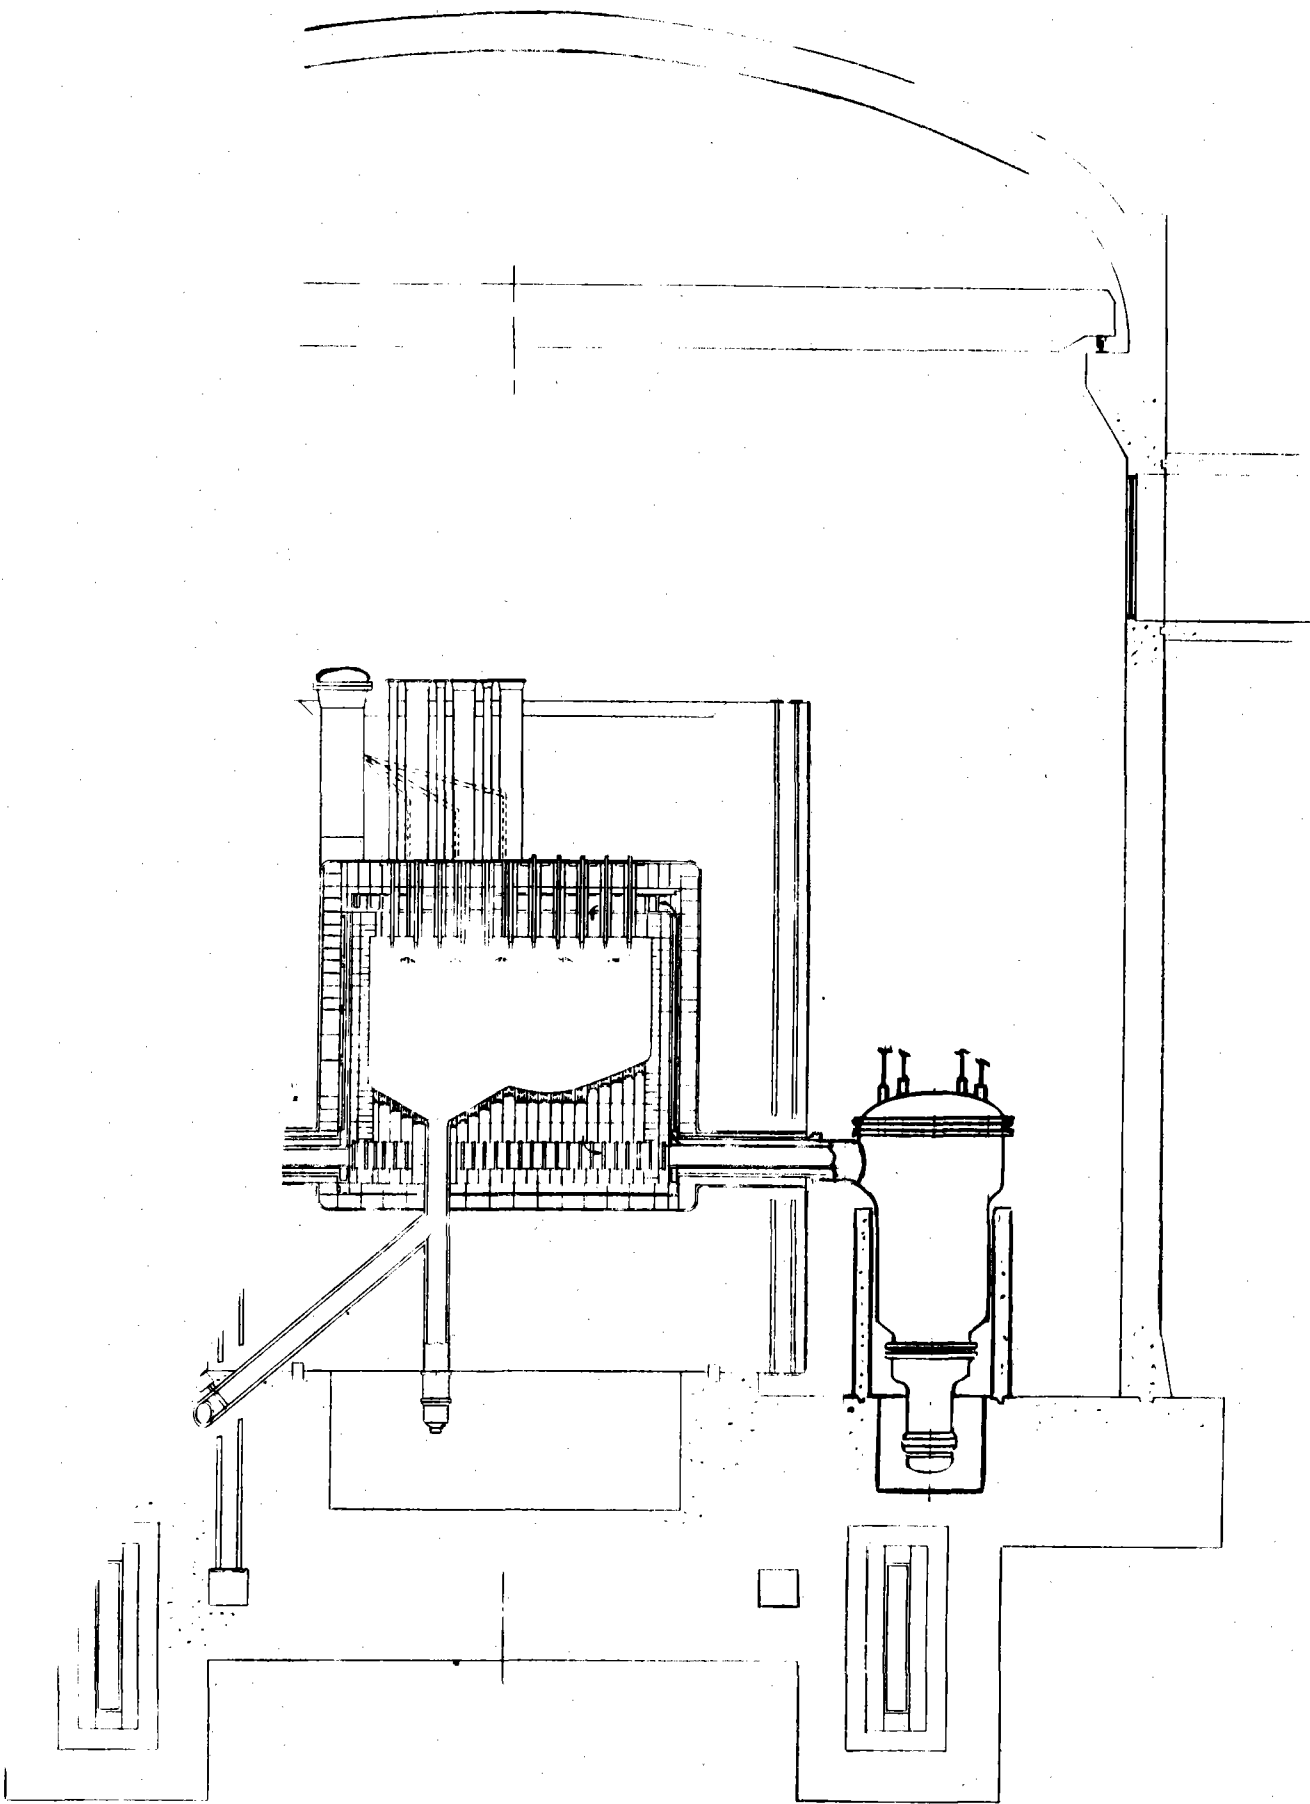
Steam Reformer Plant with "Buried Circulator" IHX.
